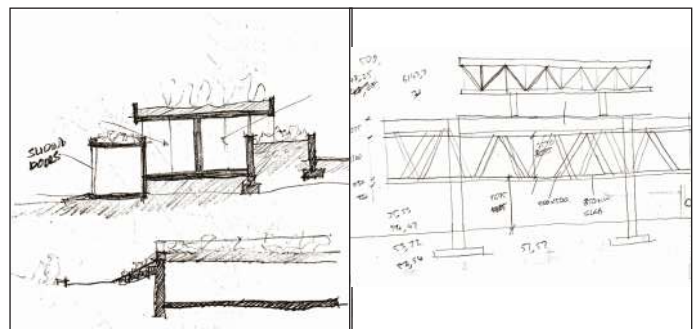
Narutal roof to allow light and ventilation and gym facade (Author: 2019)
